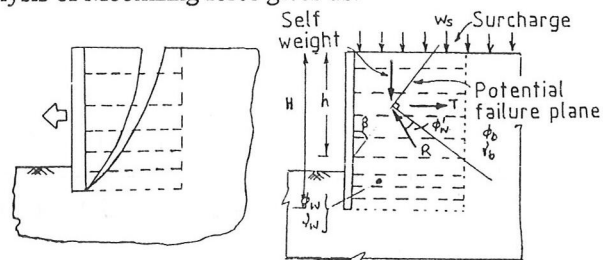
Pull-out Failure Figure 6c: Wedge Failure
